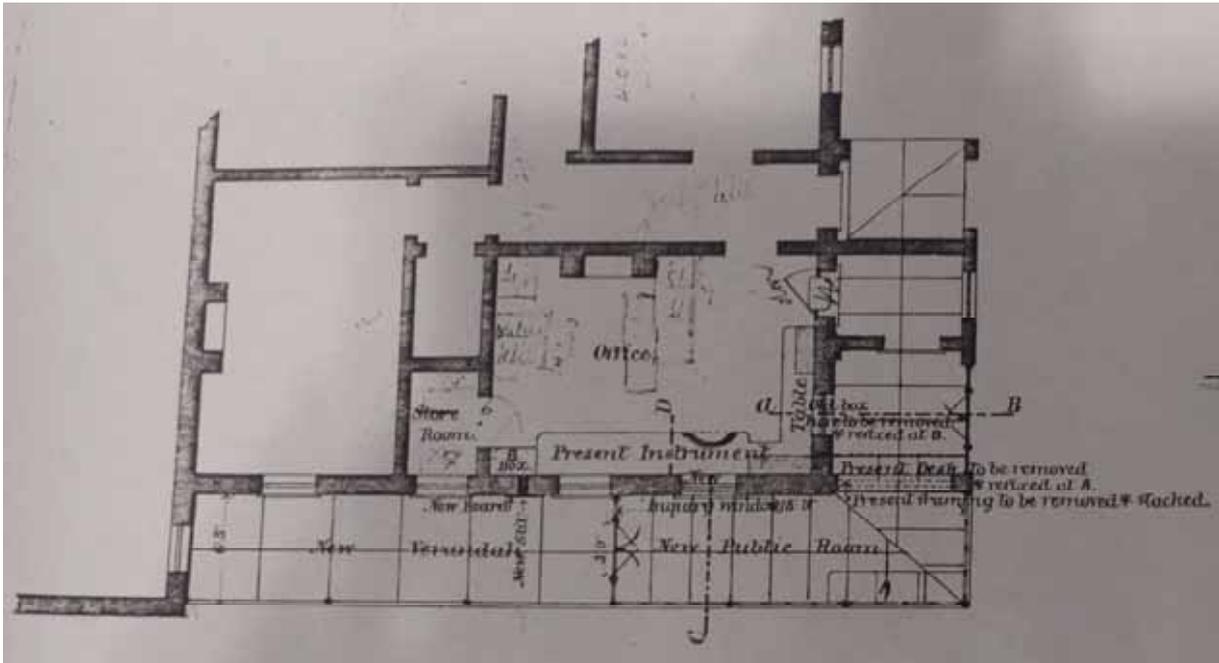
Plan dating to 1887 that showed a new verandah was proposed, along with a 'New Public Room' under the same roofline, along the Tyers Street facade (Saleta 2016).
